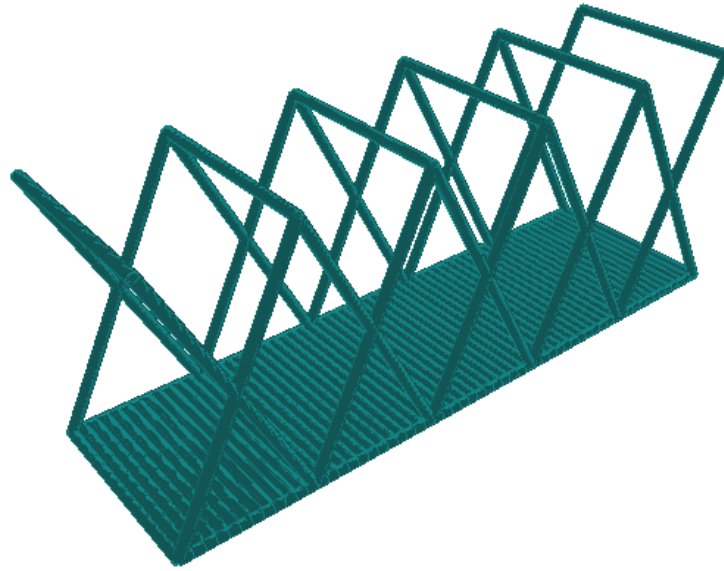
3D View of Pedestrian bridge made up of Steel section (S1)
